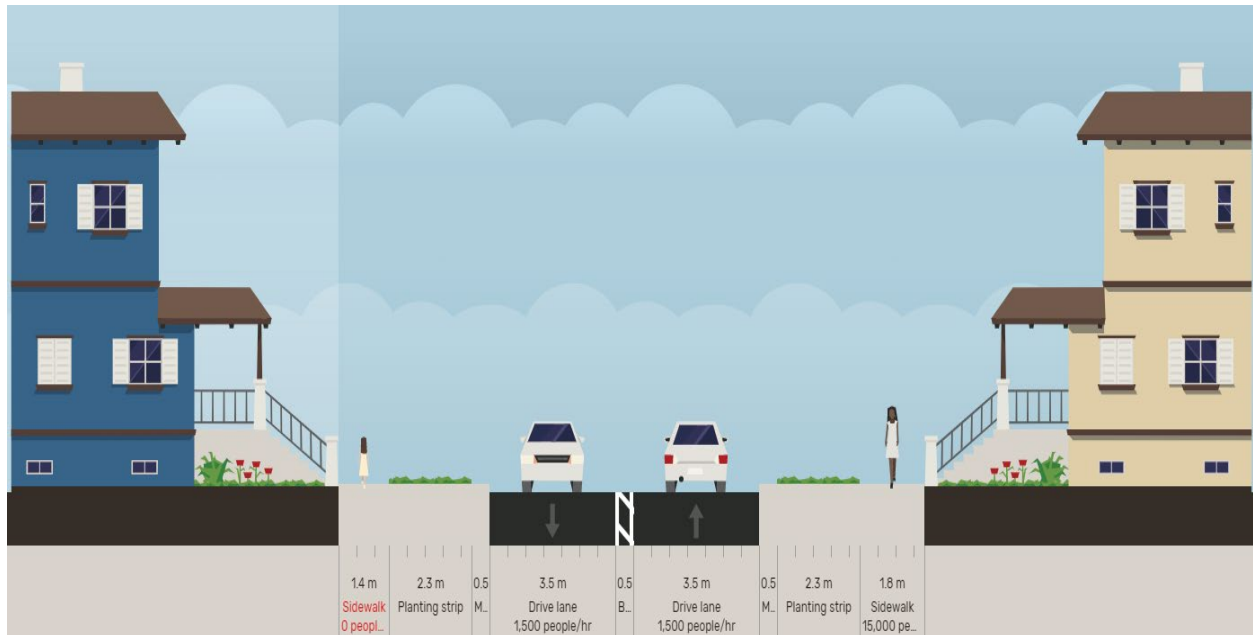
Lake Drive East: South Drive – Ravenswood Drive
